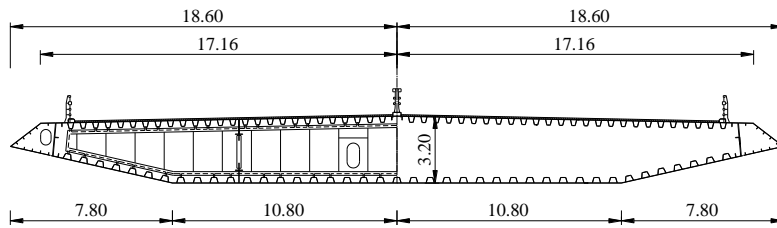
Typical cross section of the third Nanjing Bridge in the main span (Unit: m)
